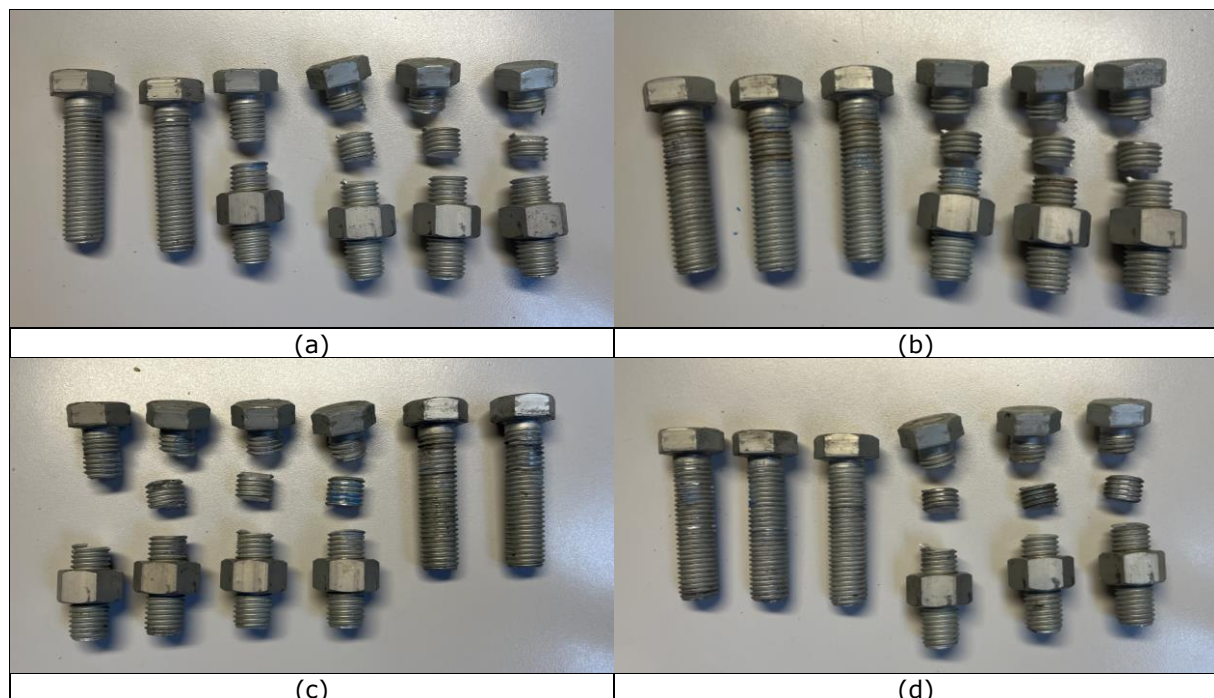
Detail 3.1 aluminium bolts at failure: (a) tension test; (b) compression test; (c) cyclic test 1; (d) cyclic test 2.
